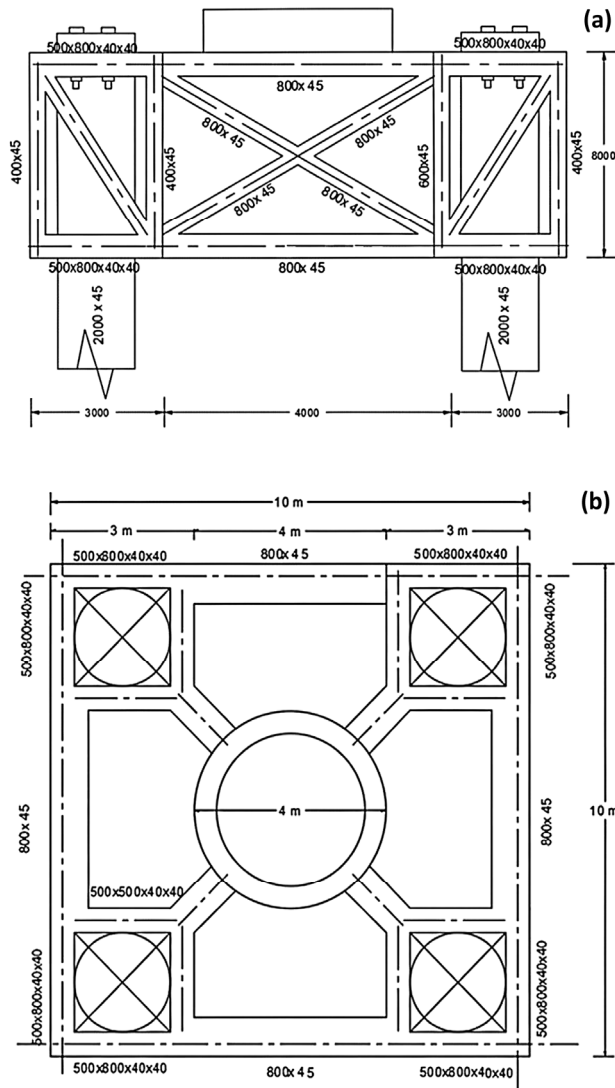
Geometrical properties of the platform: a) Elevation view; and b) Plan view
